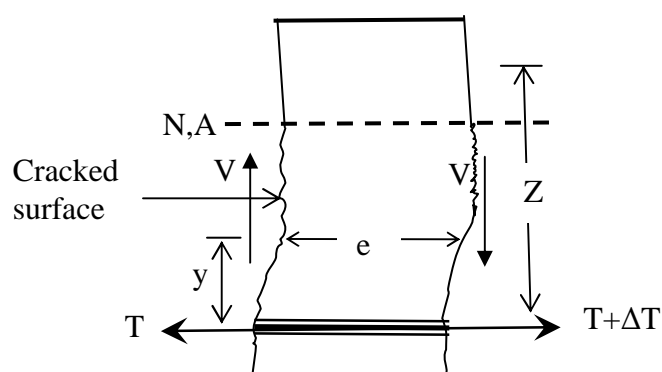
An element of a reinforced beam between two adjacent shear cracks
